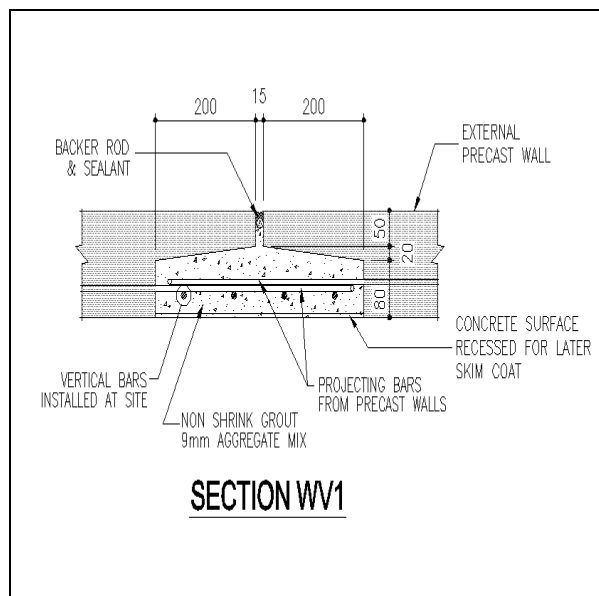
Plan of connection for long panel of facade walls or end walls
